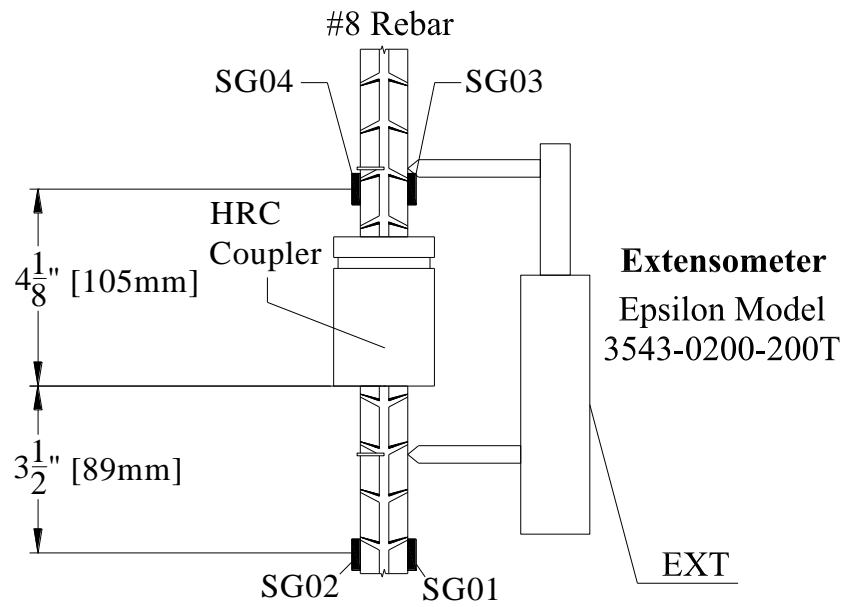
Instrumentation plan for HC couplers (Static and High Rate Tests)
